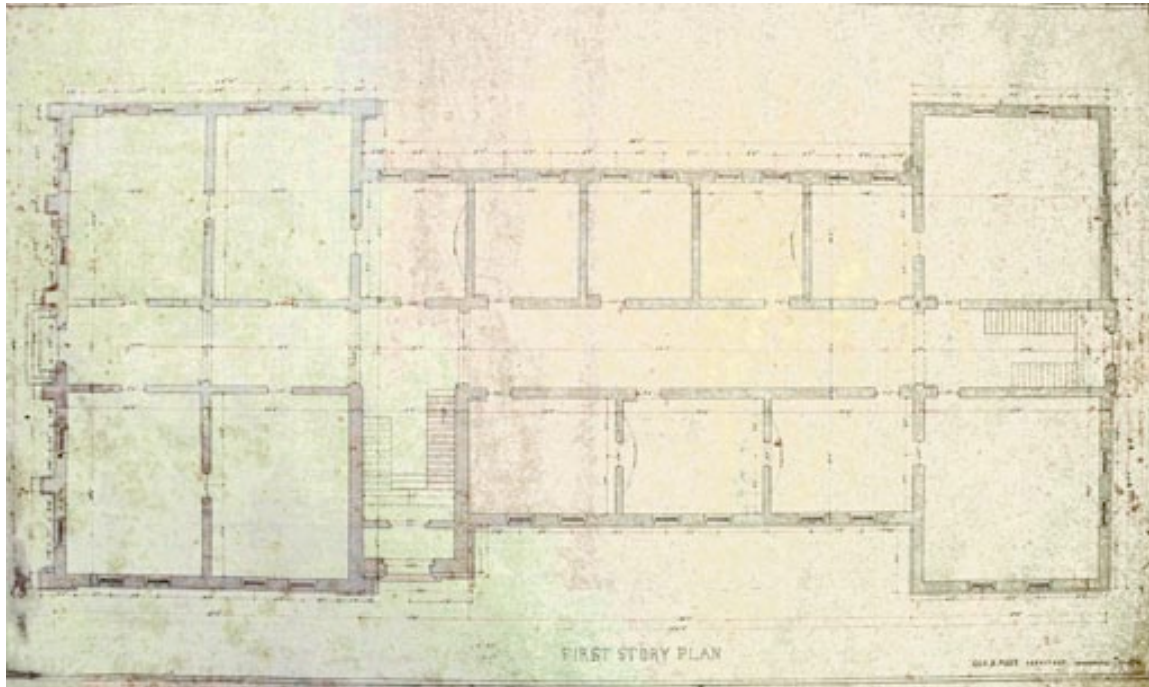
Post's Design for College Hall. First Story Plan. The floor plan, discovered in 2008 at SPC's Physical Plant Department, shows no indication of the balcony or pillars necessary for the arches which can be attributed to the head mason `Abd al-Massih. Unfortunately, the north elevation in Post's plan is missing and thus it is impossible to know with certainty what Post's design of the main façade looked like. [copyright © Syrian Protestant College]
